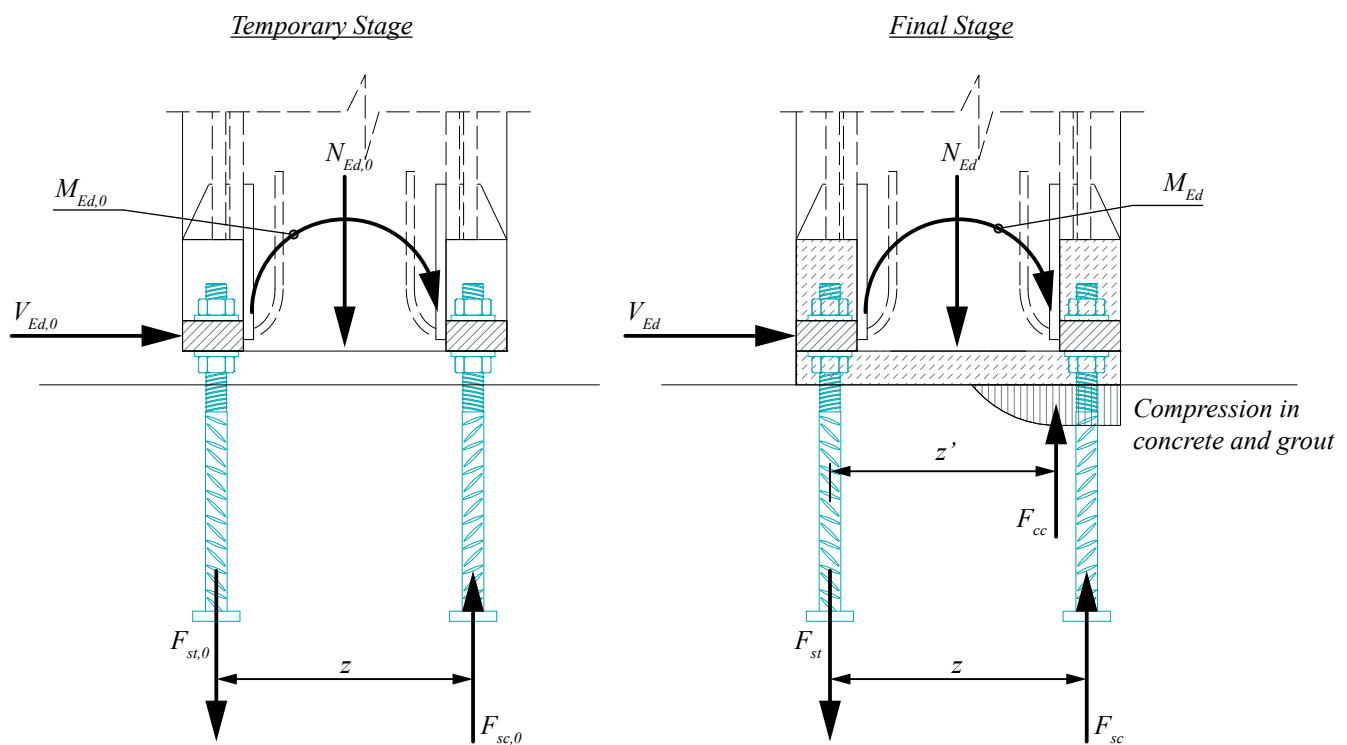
Structural behavior of the bolted connection under temporary and final conditions
